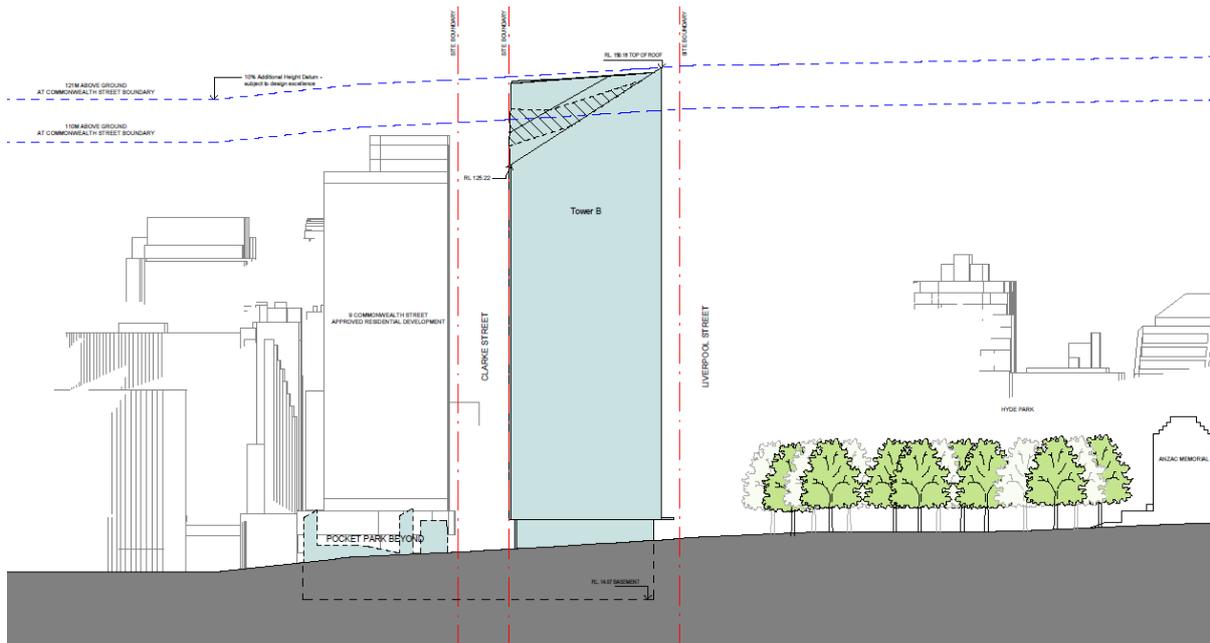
Envelope elevation to Clarke Street, showing sun access plane compliance
